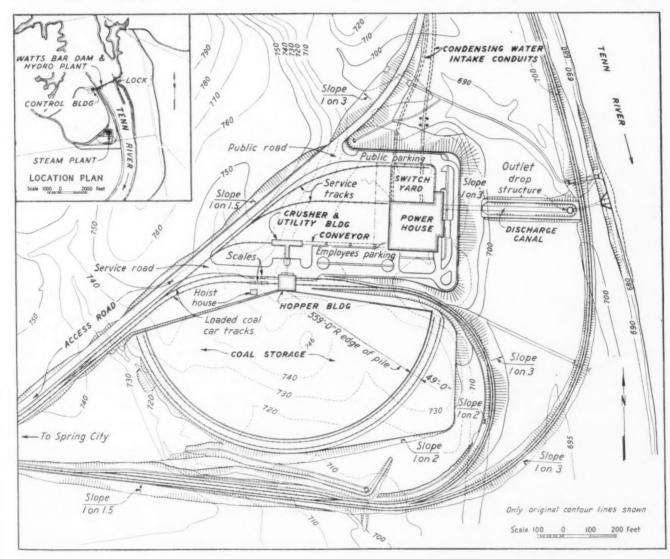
GENERAL PLAN OF WATTS BAR STEAM-PLANT SITE
